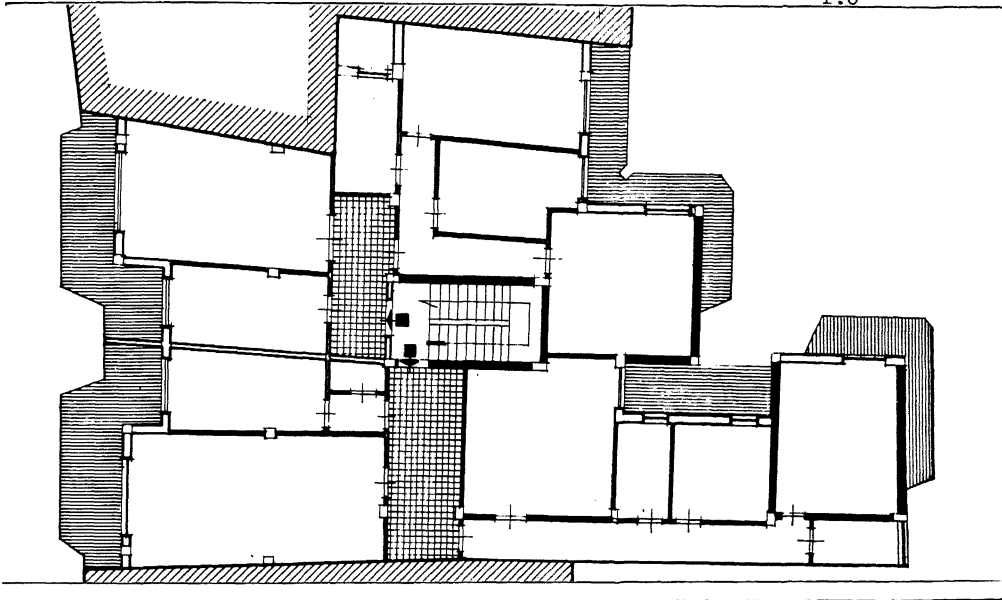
Plan of typical floor showing wall distribution (Building at Lioni - Southern Italy)
